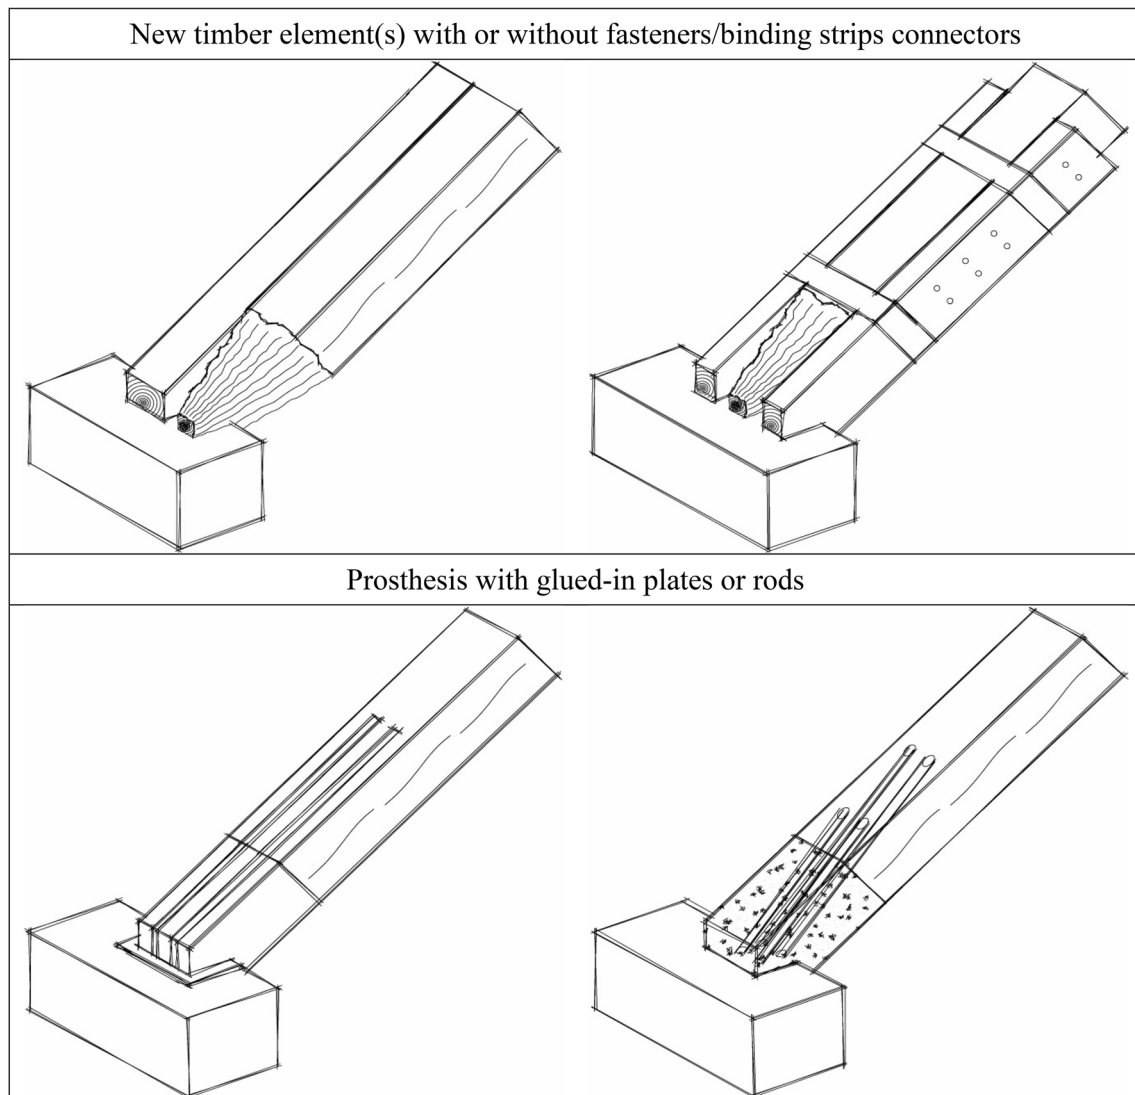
Techniques to retrofit or repair decayed birdsmouth joints. Adapted from interventions on the decayed timber beam end [36]
